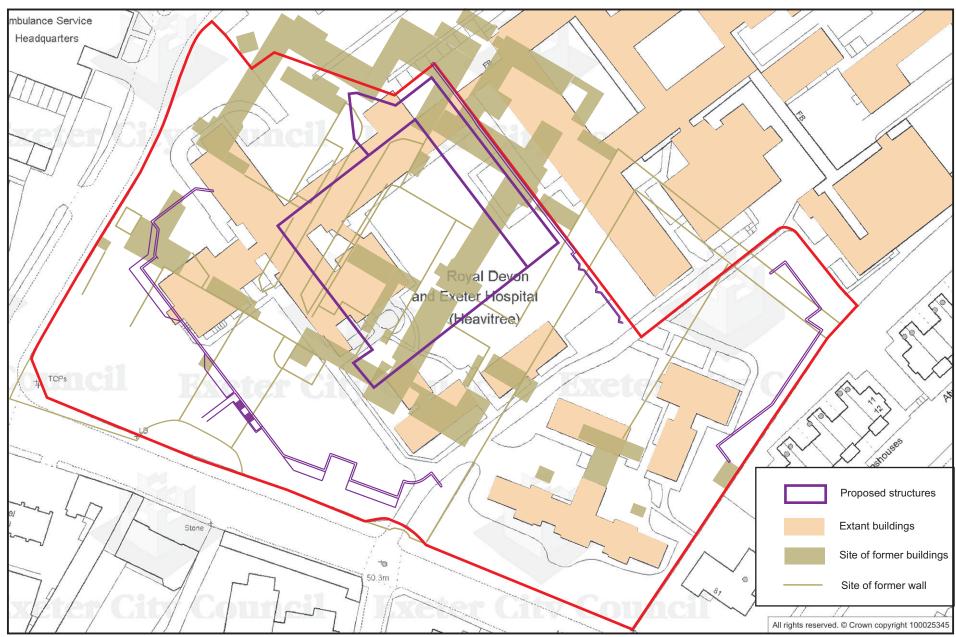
Location of former buildings and walls, extant and proposed buildings. Scale 1:1000.
